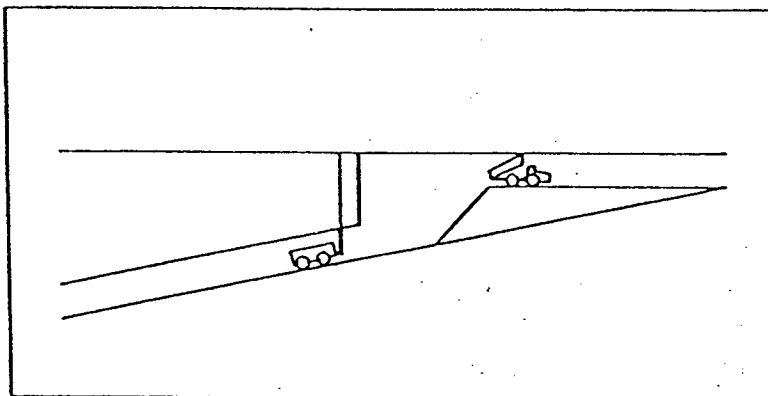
Breasting? BENCHING - HORIZONTAL HOLES.
